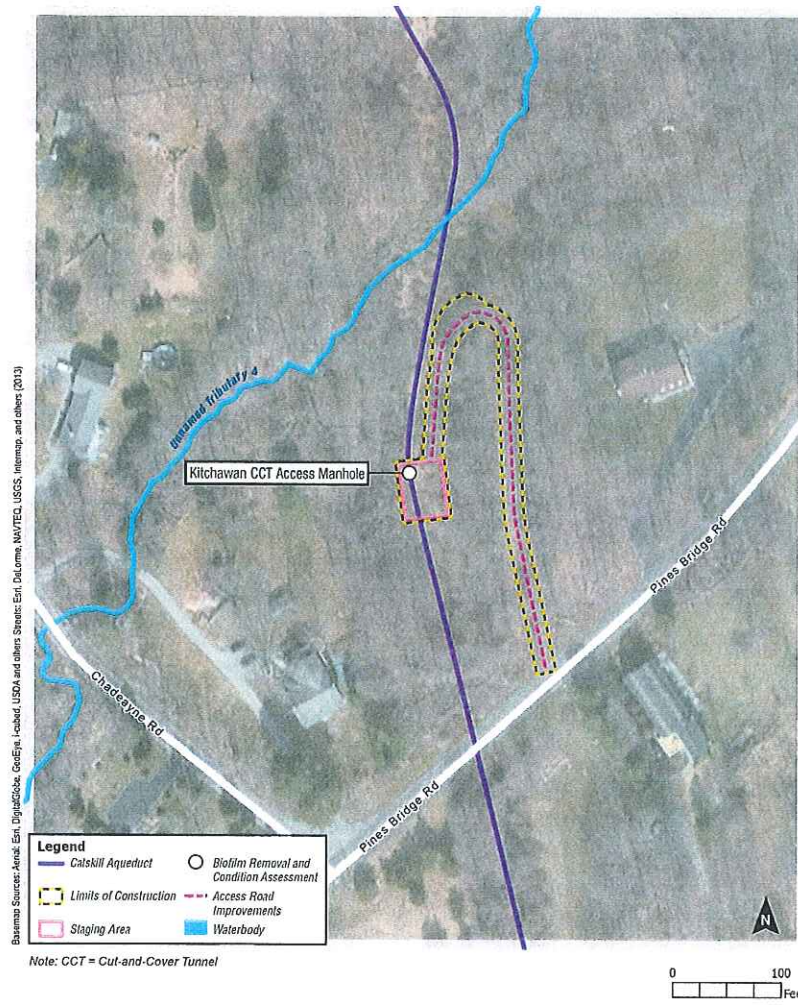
Site Plan – Pines Bridge Road Study Area
